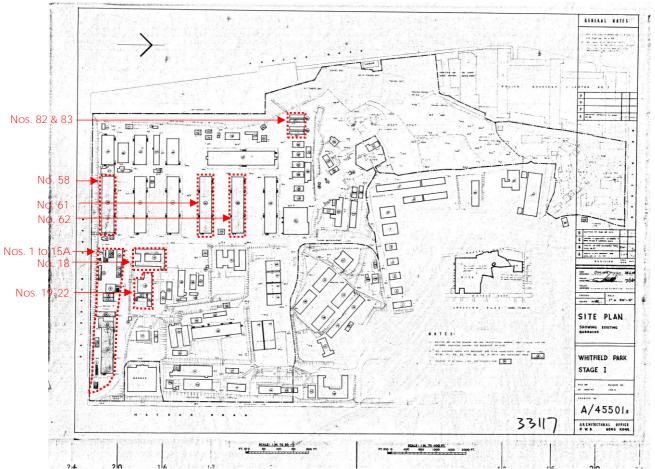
Whitfield Park Stage 1, Site Plan Showing Existing Buildings, Drawing No. A/45501E, first issued in March 1969, revision E issued on later unknown date. Notes in the drawing indicated that "all buildings within site boundary are to be demolished except Nos. 1-15A, 18-22, 61,62, 82 and 83" while remarks for revision E stated "additional retention of building No. 58". (Source: Architectural Services Department, Microfilm No. 33117)
